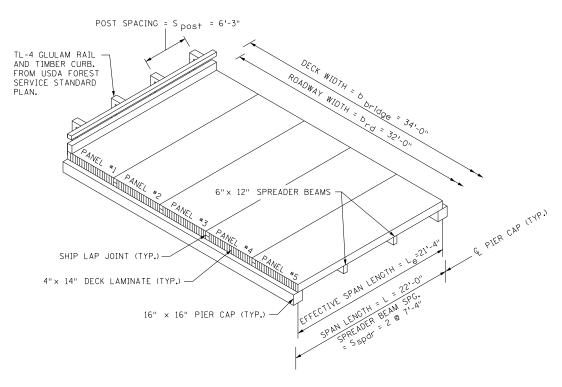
Longitudinal Timber Deck Layout\
